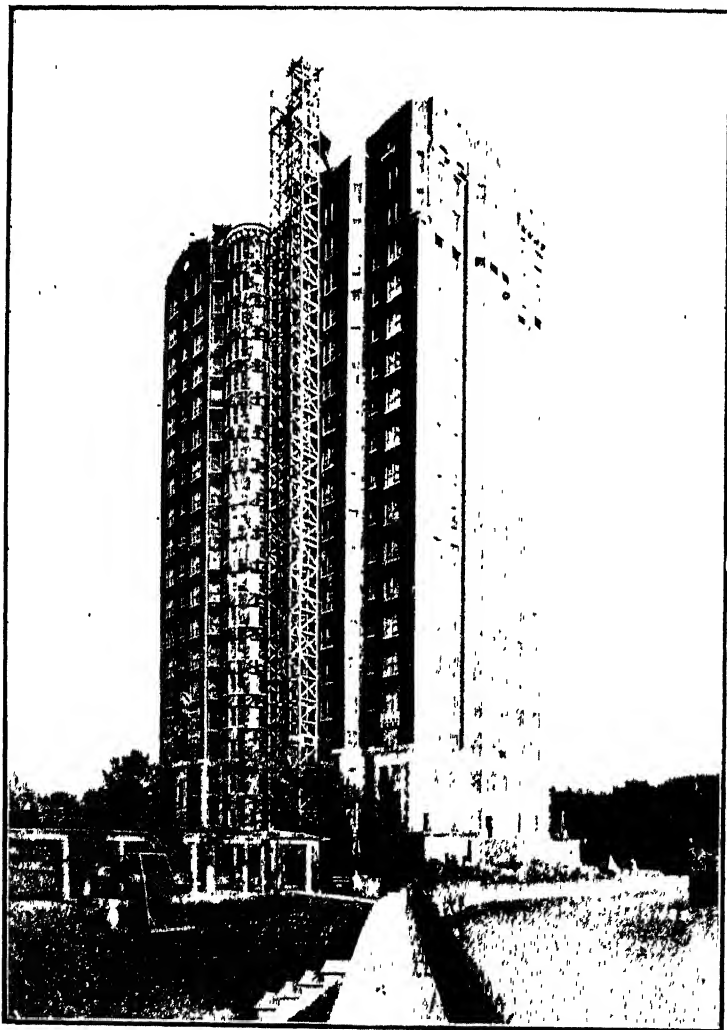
DETROIT TOWERS APARTMENTS, DETROIT, MICH., U.S.A.
